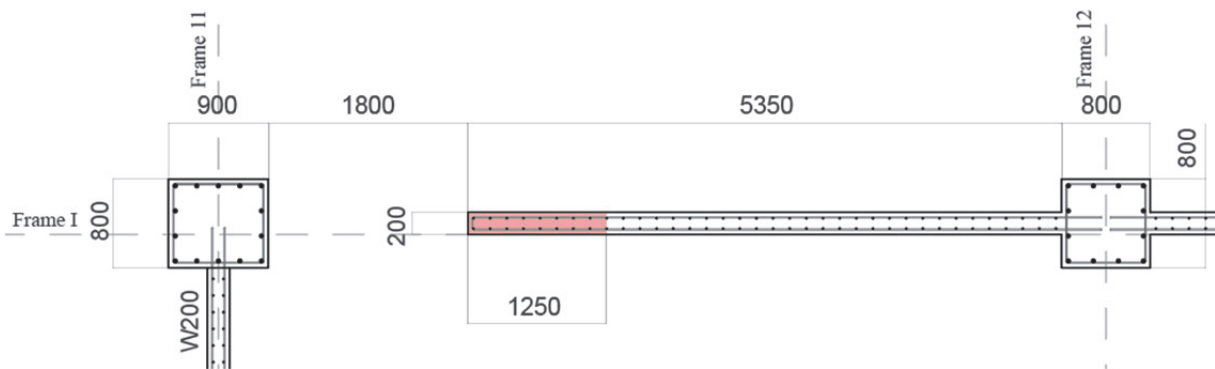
Detail of the wall at 6th story, between frames 11-12 of the frame I
